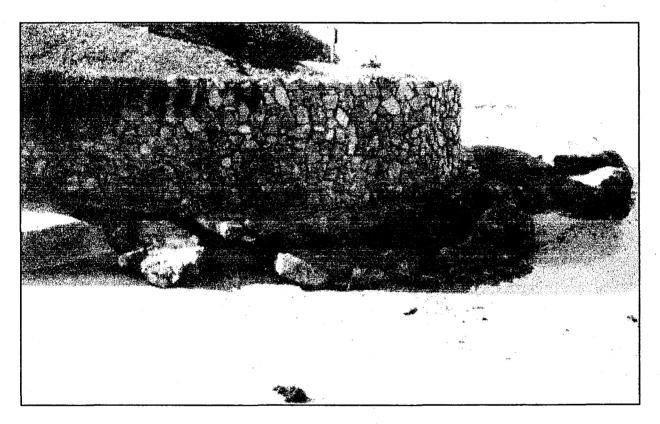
Photo showing current conditions at Site #2. Note large gap in sandstone and broken remains of rocks and concrete used in earlier repairs.
